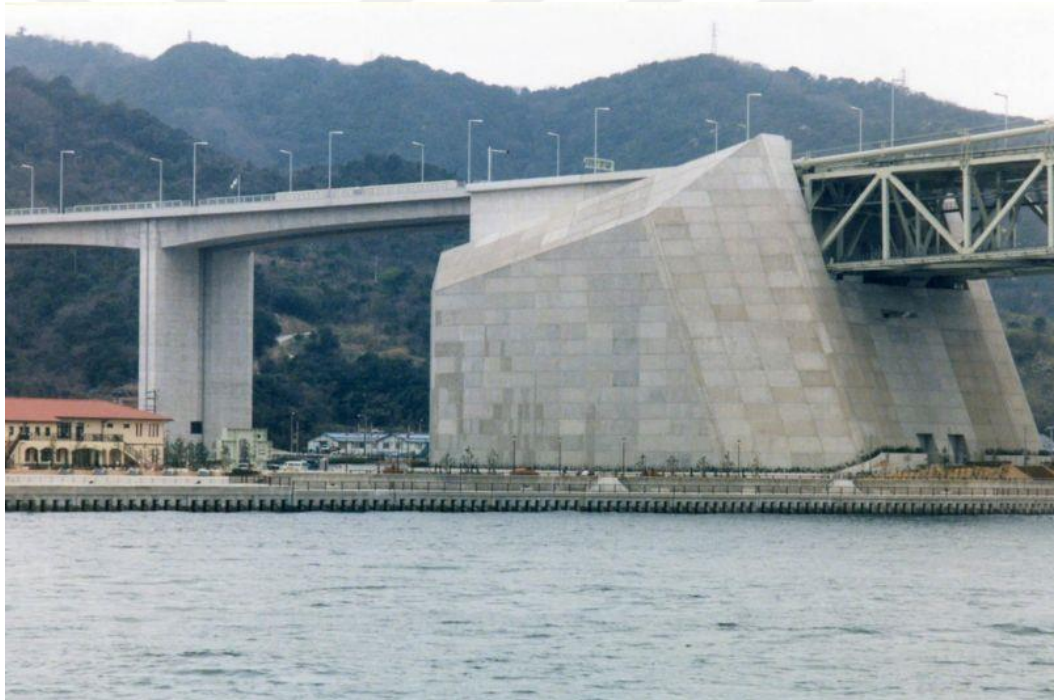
Anchorage of Akashi-Kaikyo Bridge, Japan (Ouchi and Hibino, 2000).
